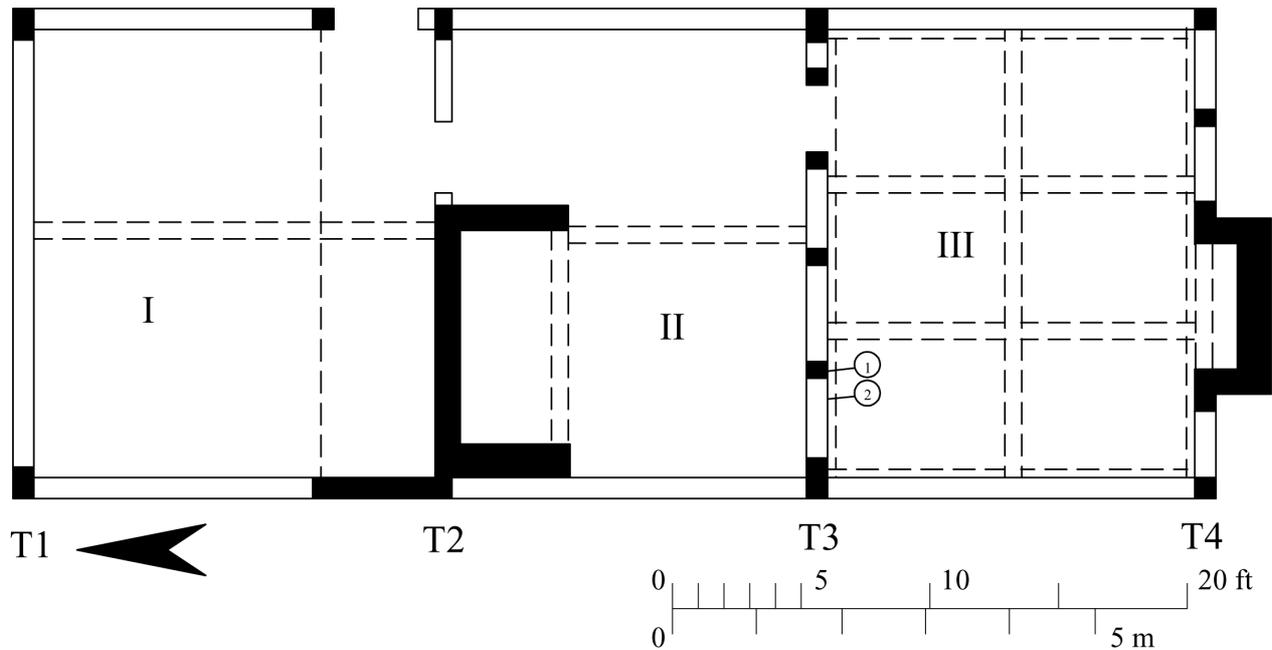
Plan, showing truss and bay numbering (not fully to scale).
